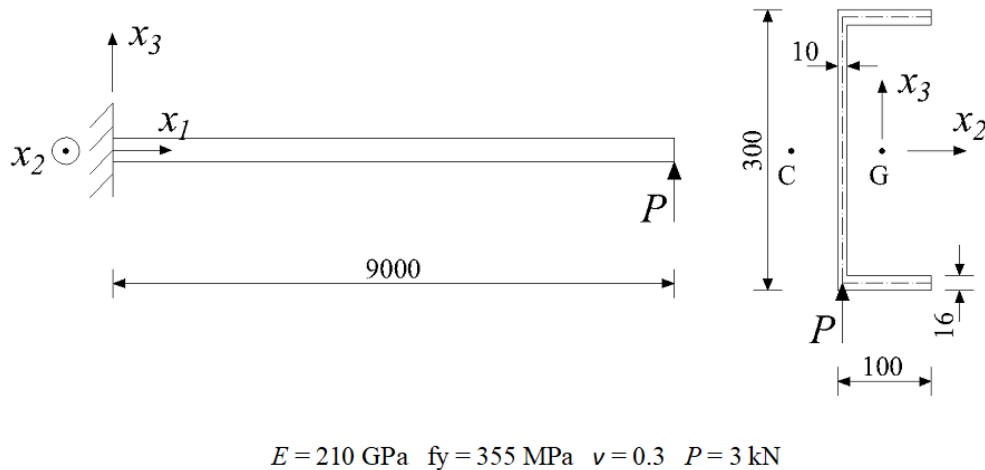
Cantilever beam with C-shaped cross-section. Dimensions in mm
